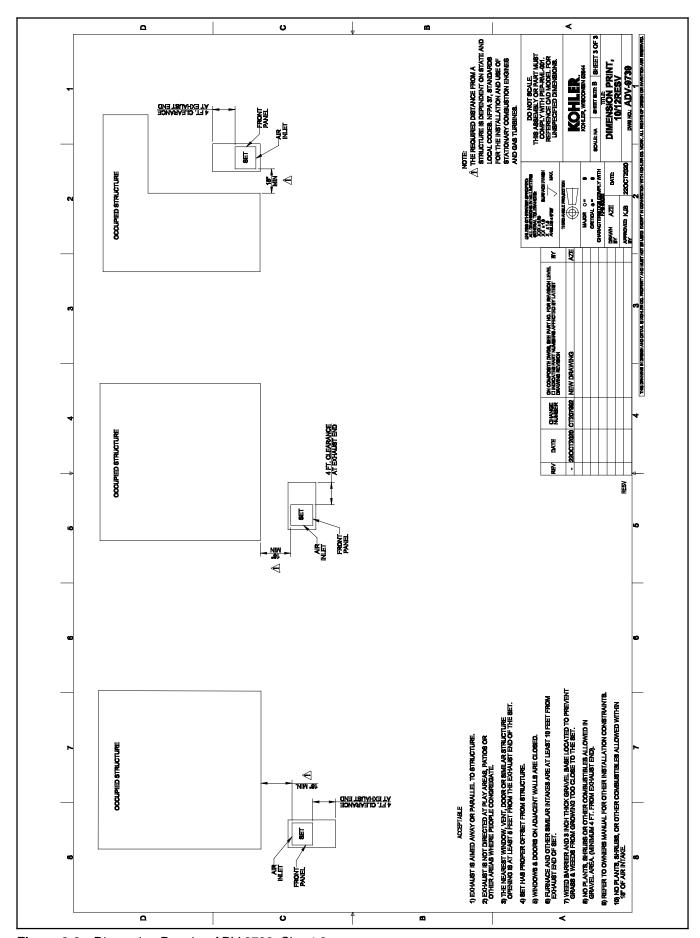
Dimension Drawing ADV-9739, Sheet 3
